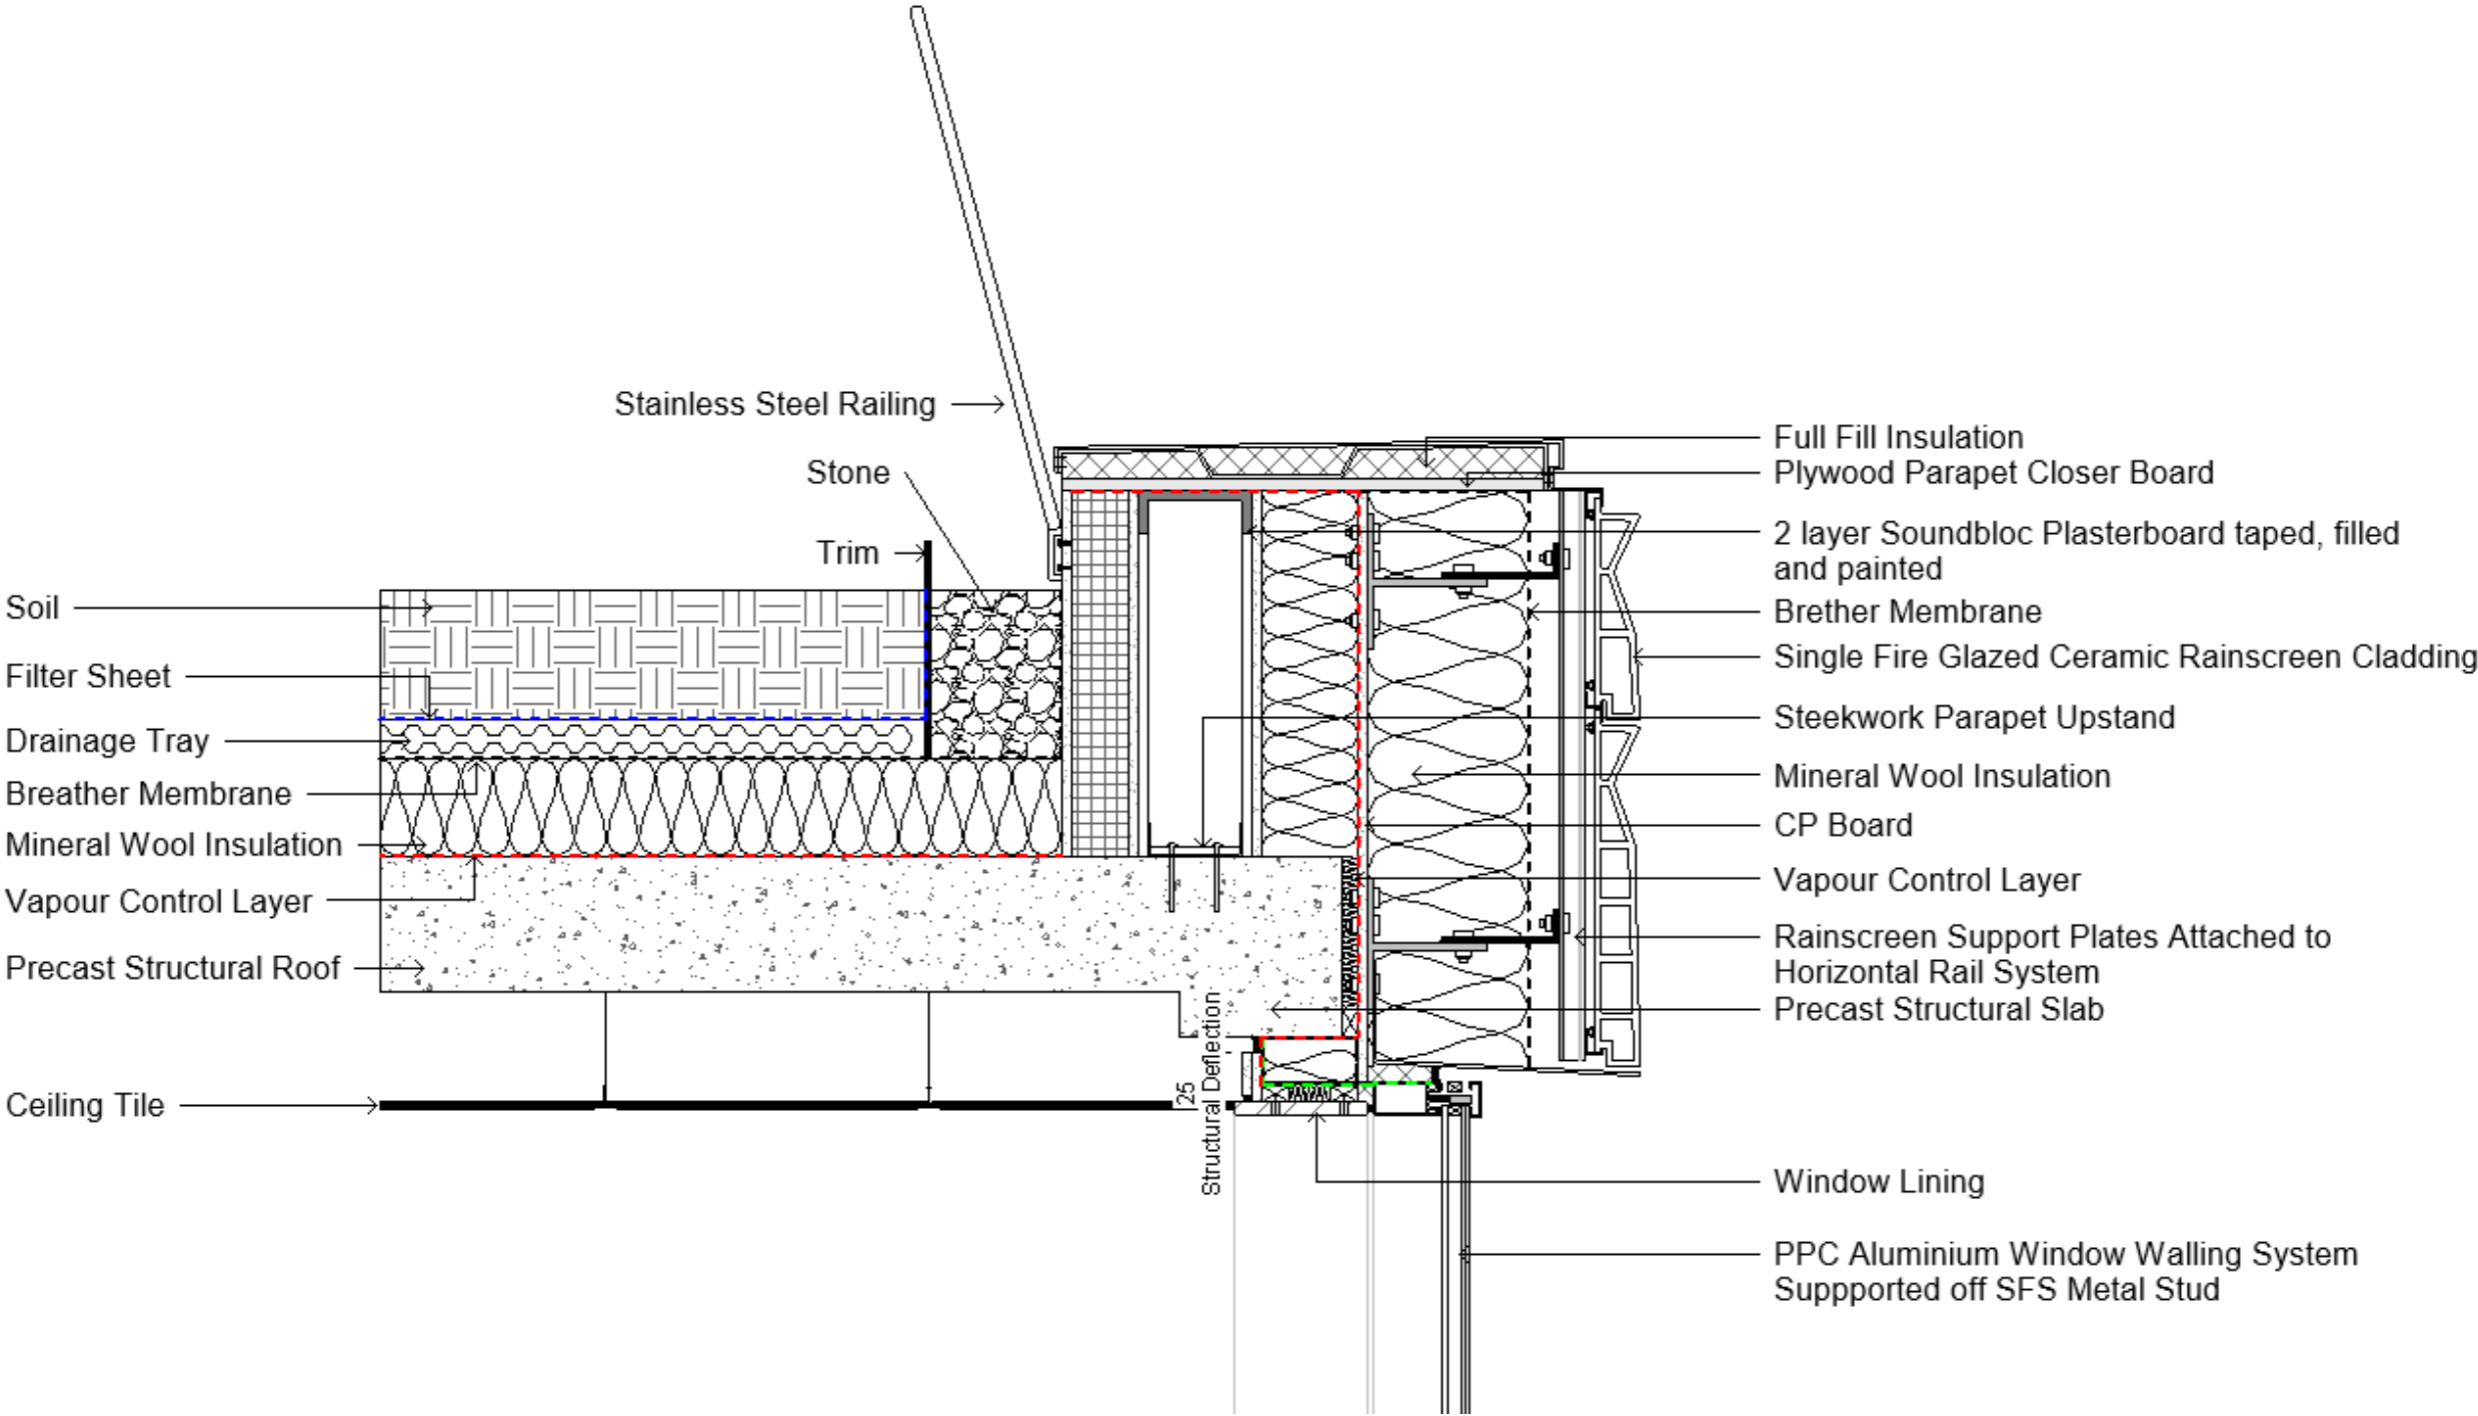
Green Roof Enlarged Detail (Author, 2021)
